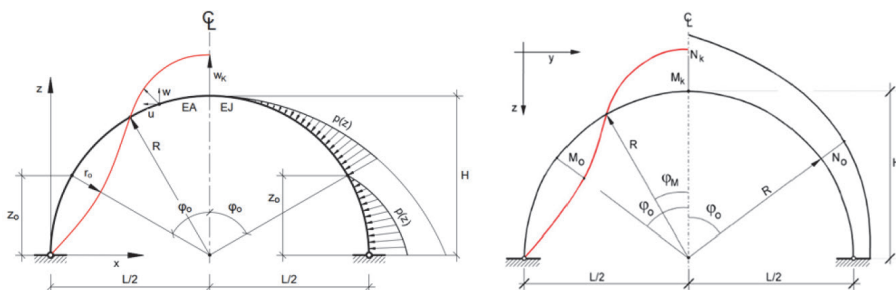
Scheme of infill action and deformation of circumferential shell strips during staged concreting
